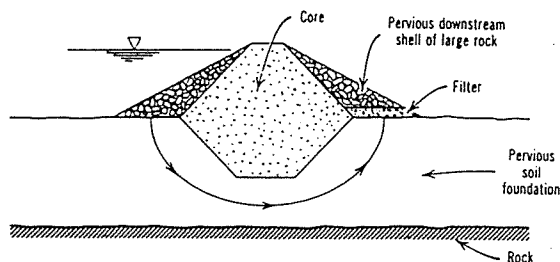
1 Need for filter under downstream rockfill shells on soil foundation.
